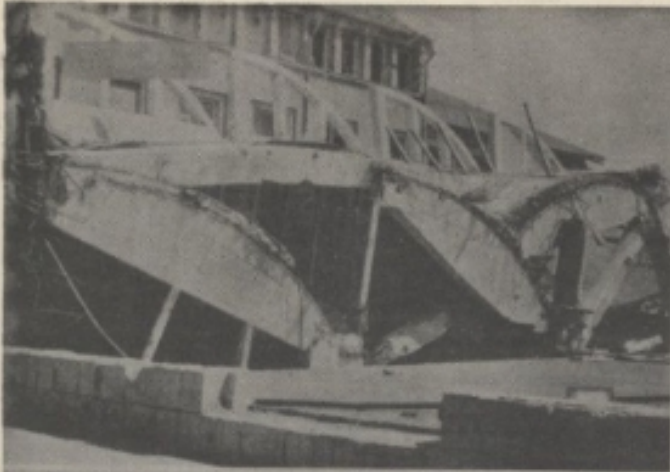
Oberwiesenfeld - Spreading collapse. Note how external wall remained standing.
